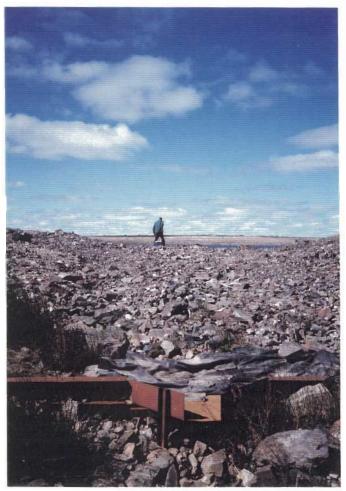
Spillway No. 1 looking upstream (west). Note flow measurement weir.
